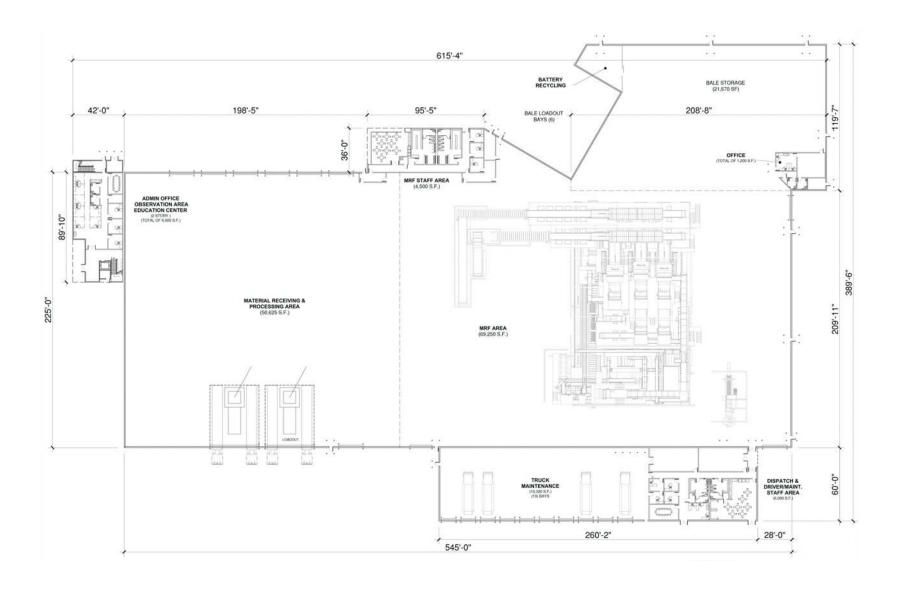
Overall Building Plan Source: JRMA for CWS, dated 2/14/20
